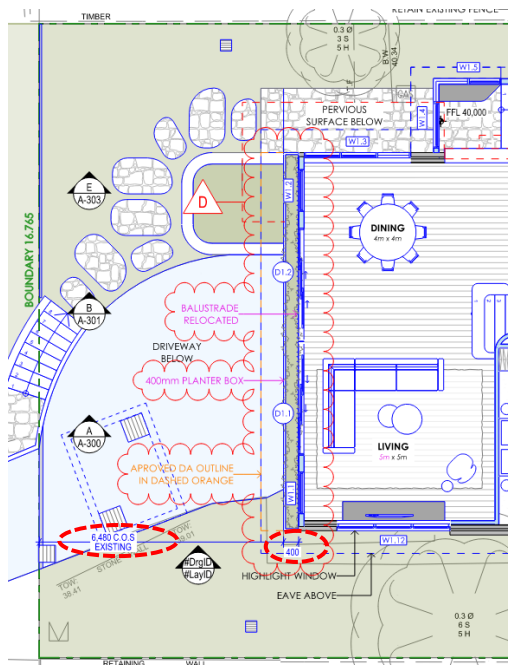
ground floor plan - proposed modification showing the planter accommodated within the approved living room space and 6,480mm to the front boundary
